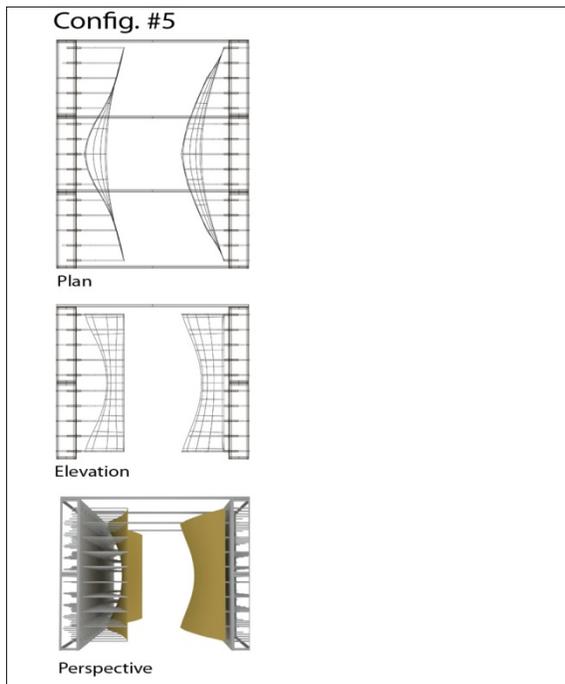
(Faulkner) Machine Positions 5: Plan, Elevation, and Perspective
